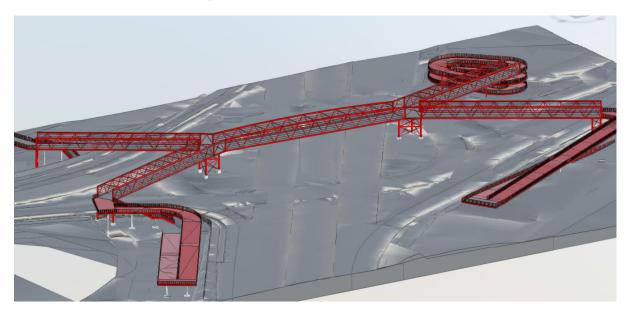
Naas Road Pedestrian and Cycle Bridge 3D Model looking eastwards from Naas Road
